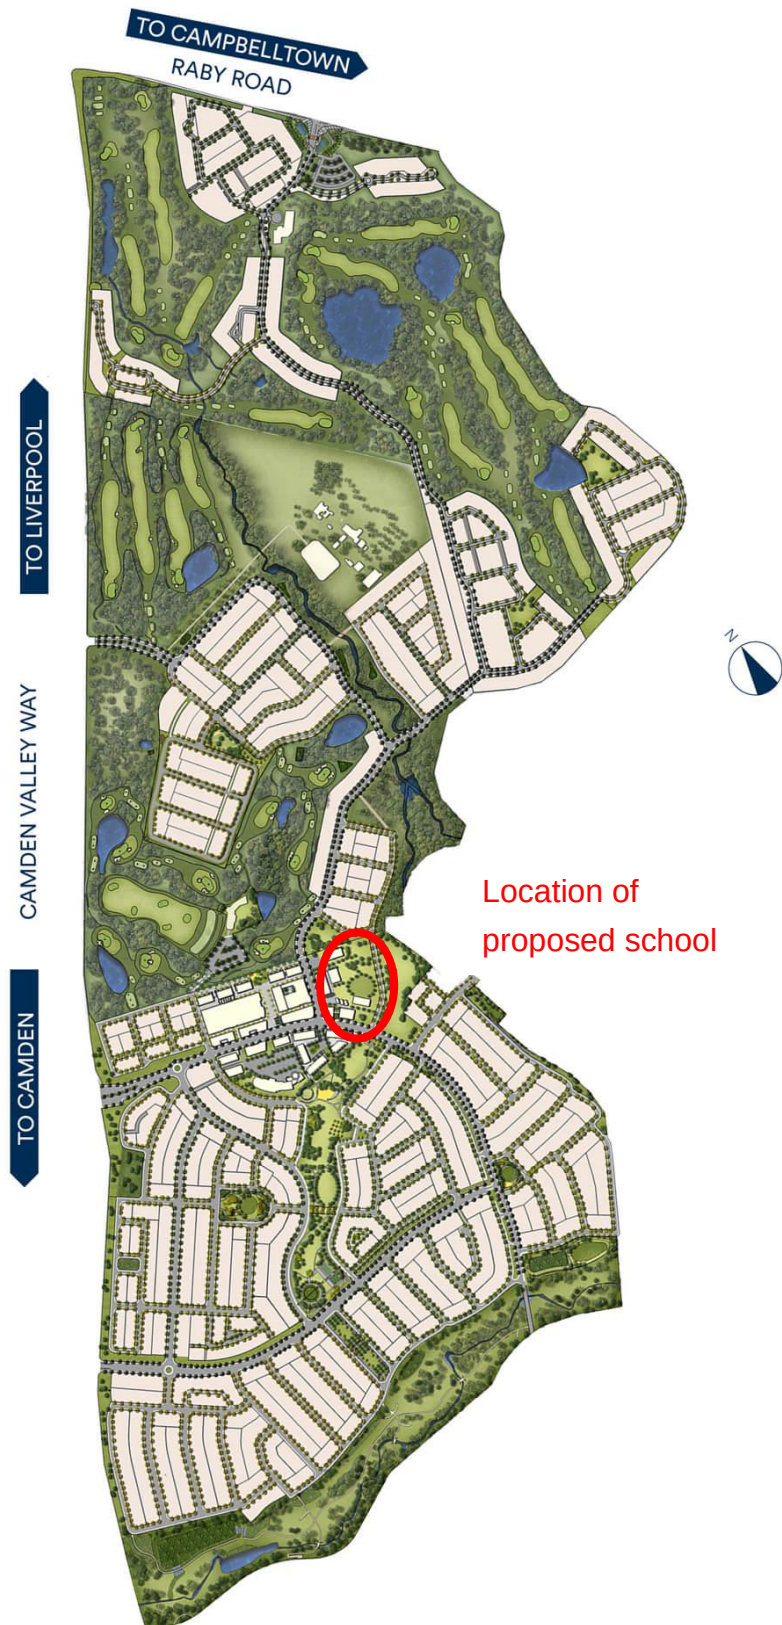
Gledswood Hills (The Hermitage) Master Plan
